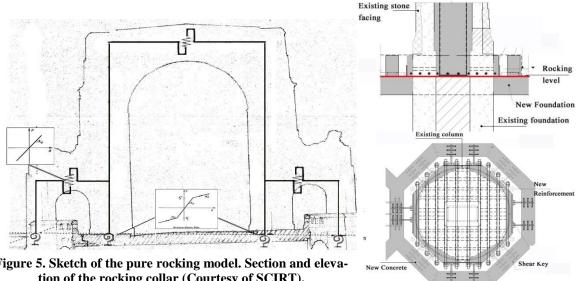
Sketch of the pure rocking model. Section and elevation of the rocking collar (Courtesy of SCIRT).
